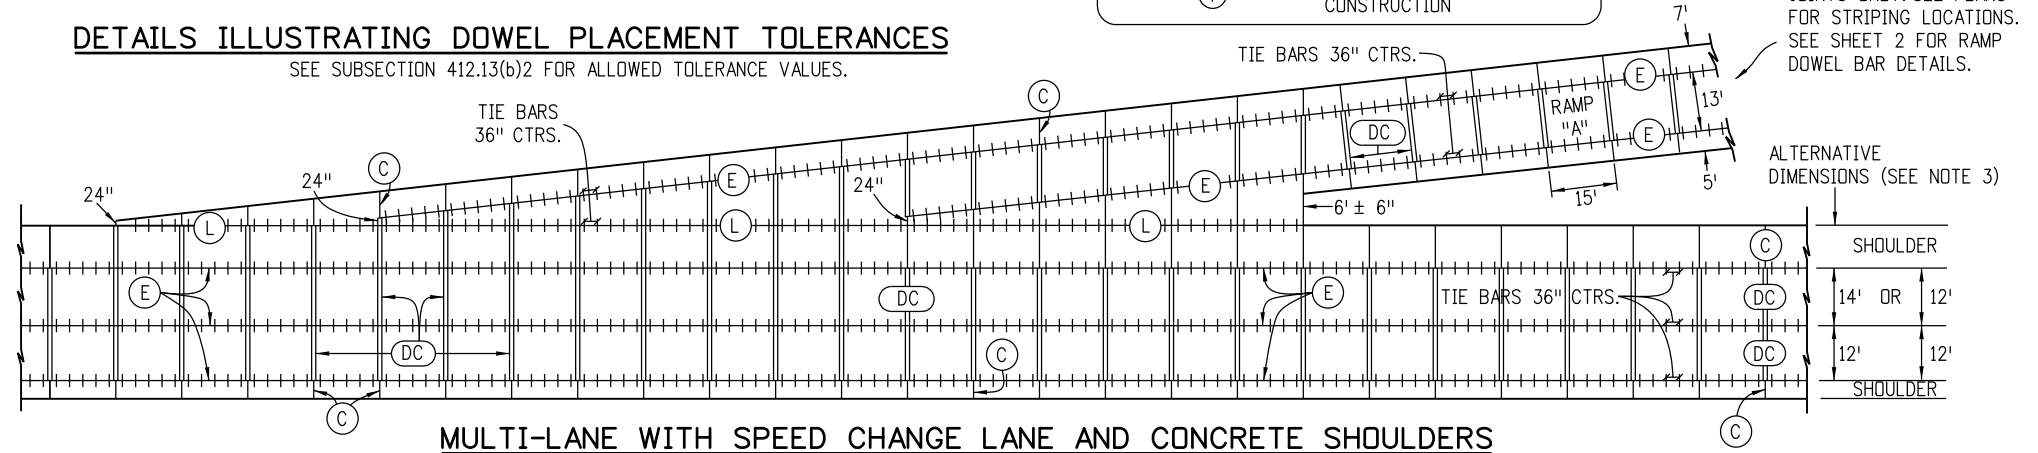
DETAILS ILLUSTRATING DOWEL PLACEMENT TOLERANCES
